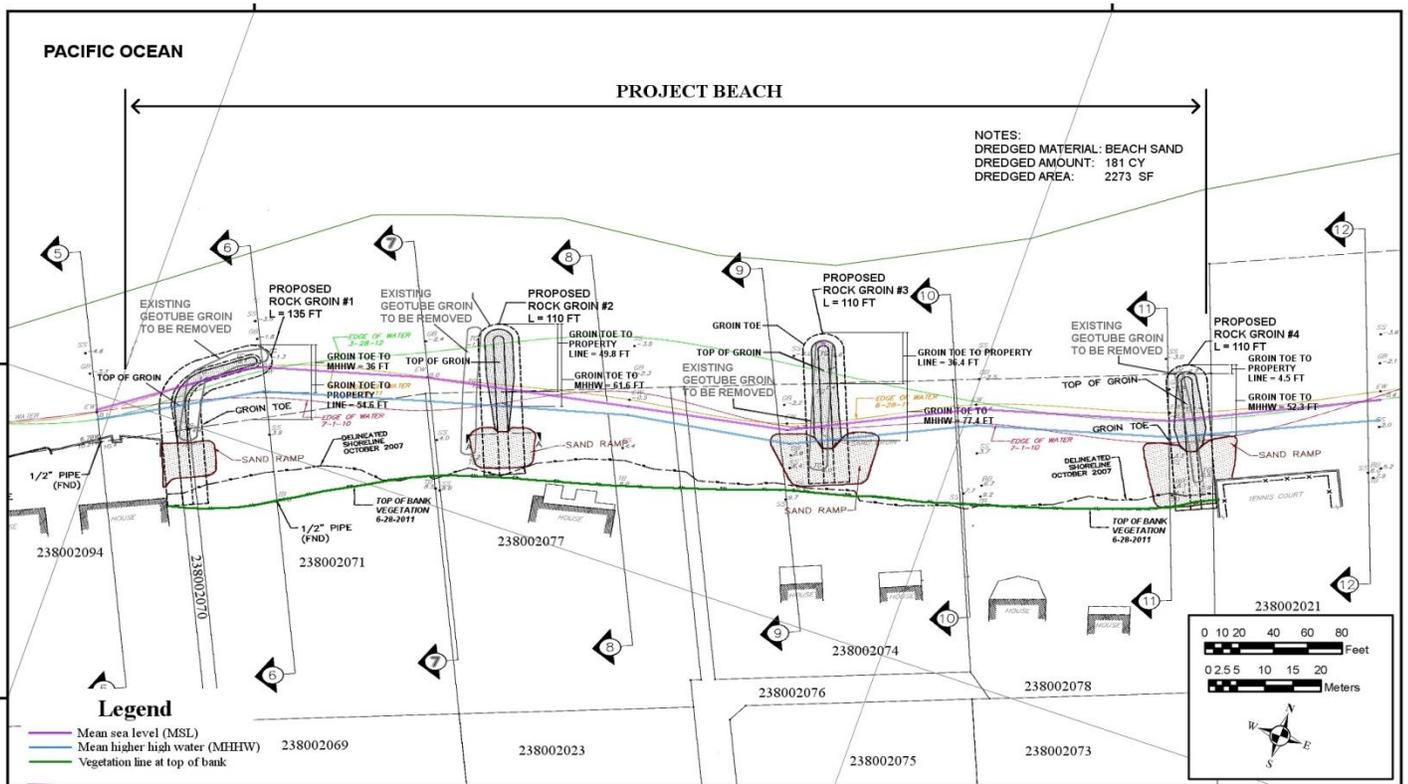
Proposed Action Site Plan and Replacement Groin Cross Section - 4 Groin Plan
